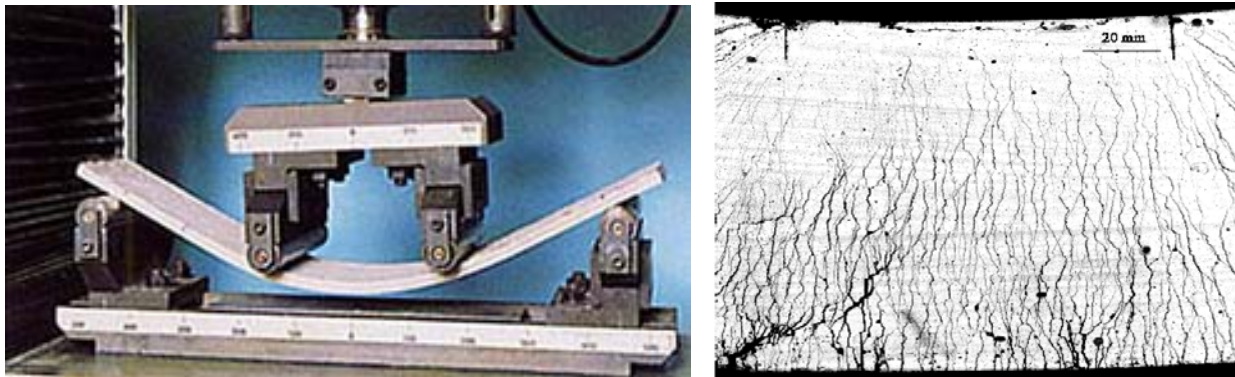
Bendable concrete ECC [6]; multiple cracking pattern in ECC beam midspan around peak load [5]
